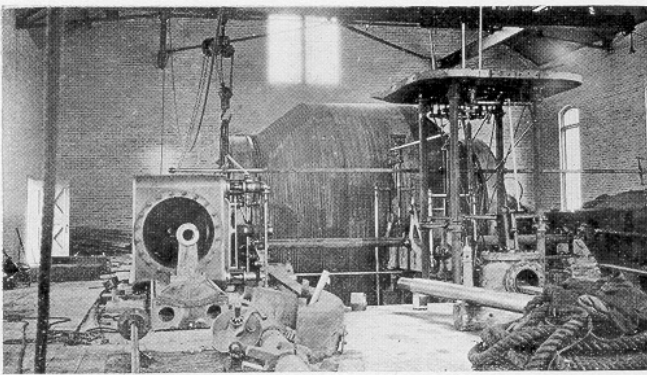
Plate VII. A. Installing new hoist at Lake Mine, 1911.
